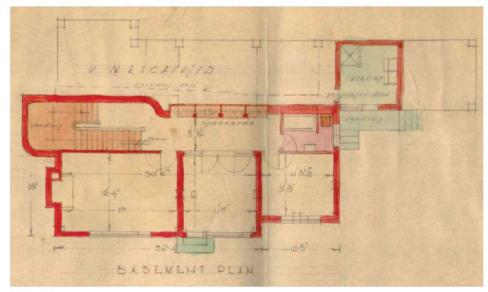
Original Basement level plan, c. 1938 Source: Woollahra Council
